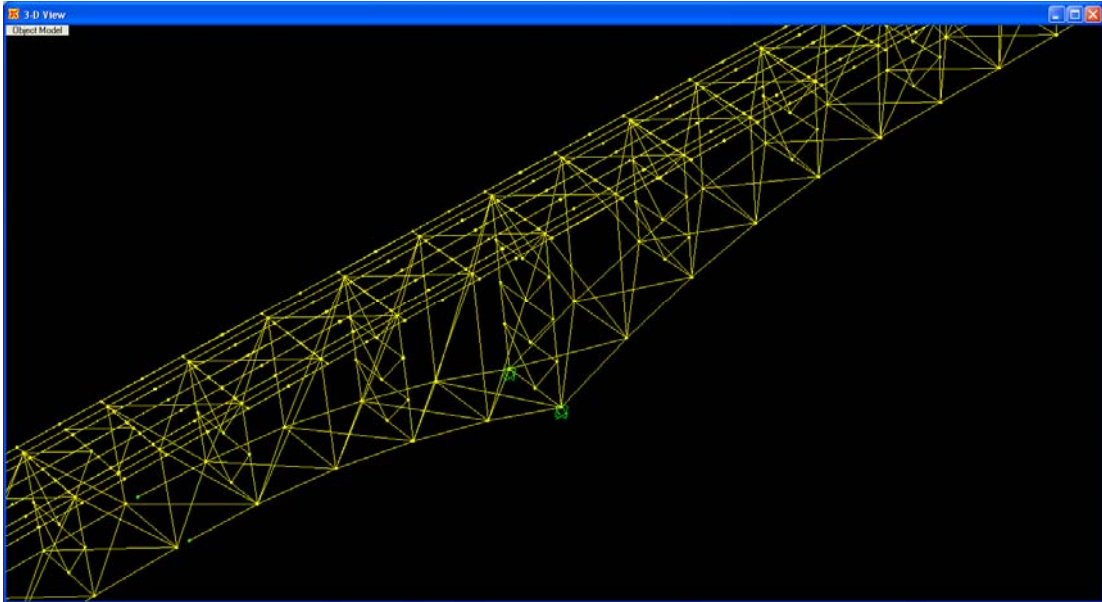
SAP2000 Model of Deck Cantilever Truss Bridge (Zoomed In)
